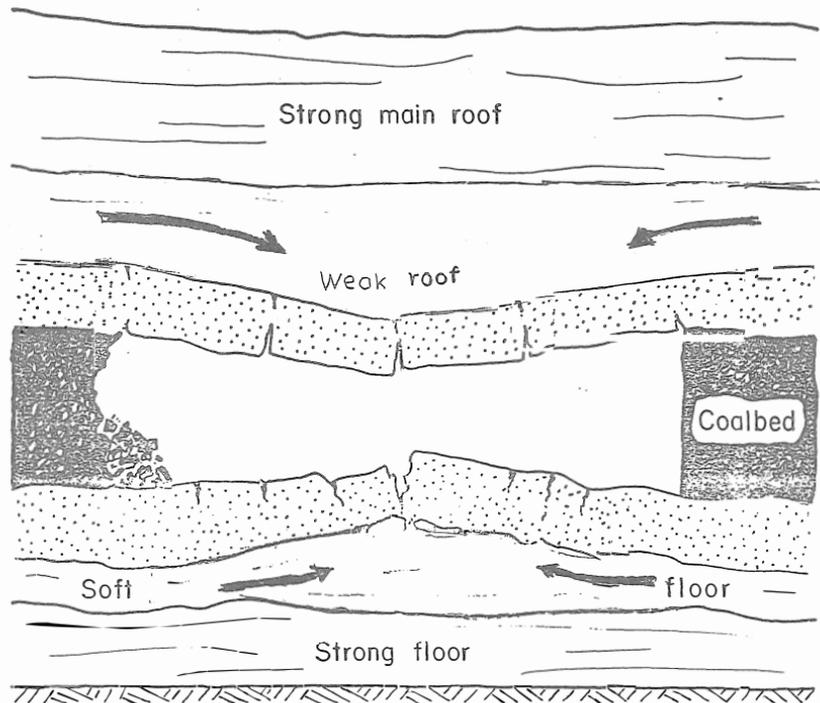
Strong immediate roof and floor broken by softer adjacent strata.
